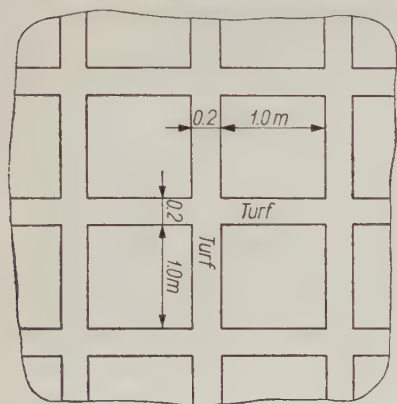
Turf revetment of the sandy slopes of bridge approaches
